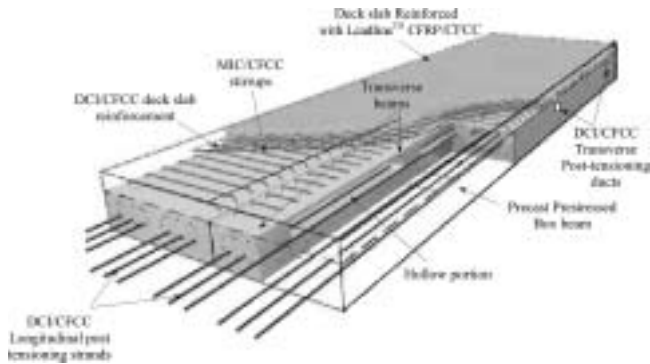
Typical box-beam bridge model reinforced and prestressed with CFRP-DCI tendons/CFCC strands.
